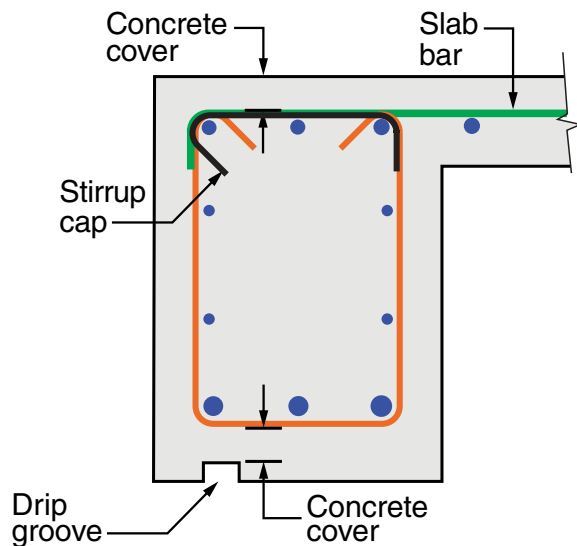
Designers should be aware that drip grooves control the cover on exterior framing elements.
